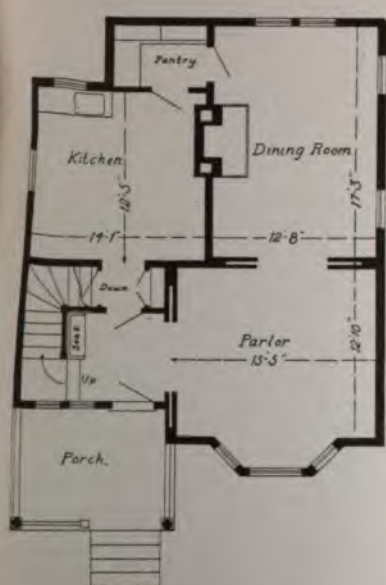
HOUSE FOR EMPLOYEES, PLAN Q
